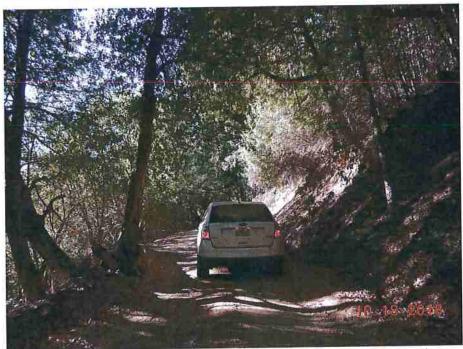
RP10. Pinch point. No sight distance restriction. Turnout provided. Facing north-west.
